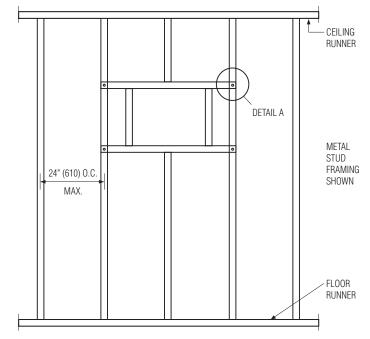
SINGLE VERTICAL STUD OPENING PREPARATION DETAILS.
